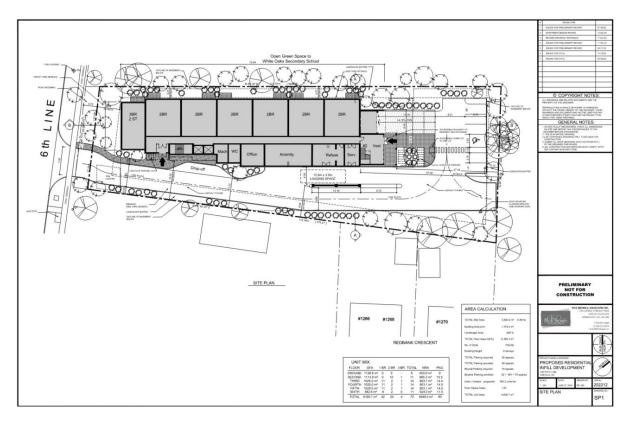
Concept Plan for Apartment, dated June 6, 2024
